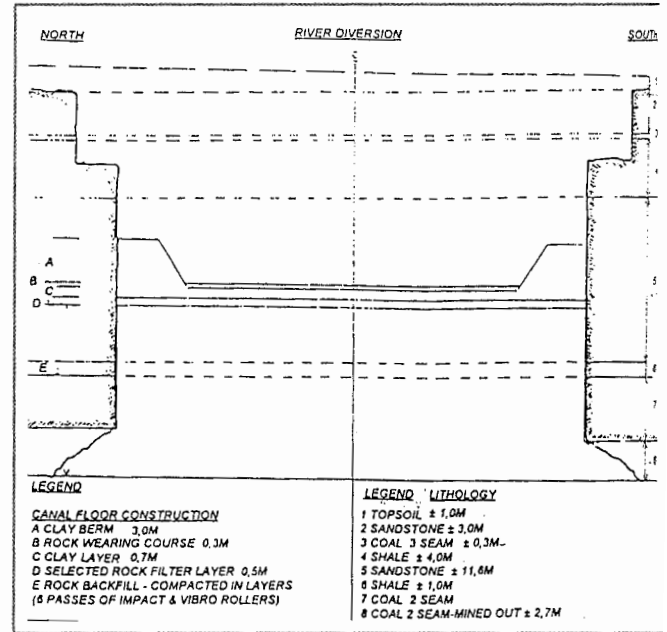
Diagrammatic section. Showing the lithology and canal as built (backfilled portion).
